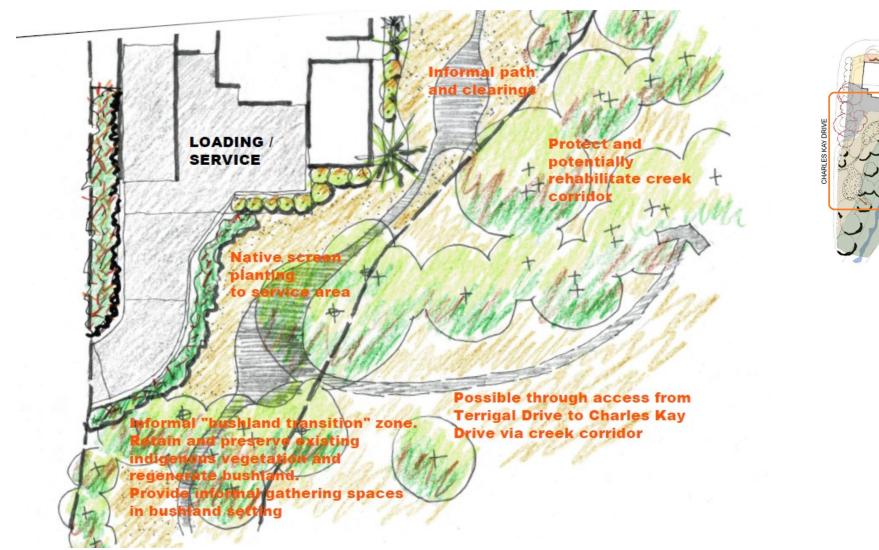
DETAIL PLAN B – COMMUNAL OPEN SPACE AND TERRIGAL DRIVE STREET ADDRESS
